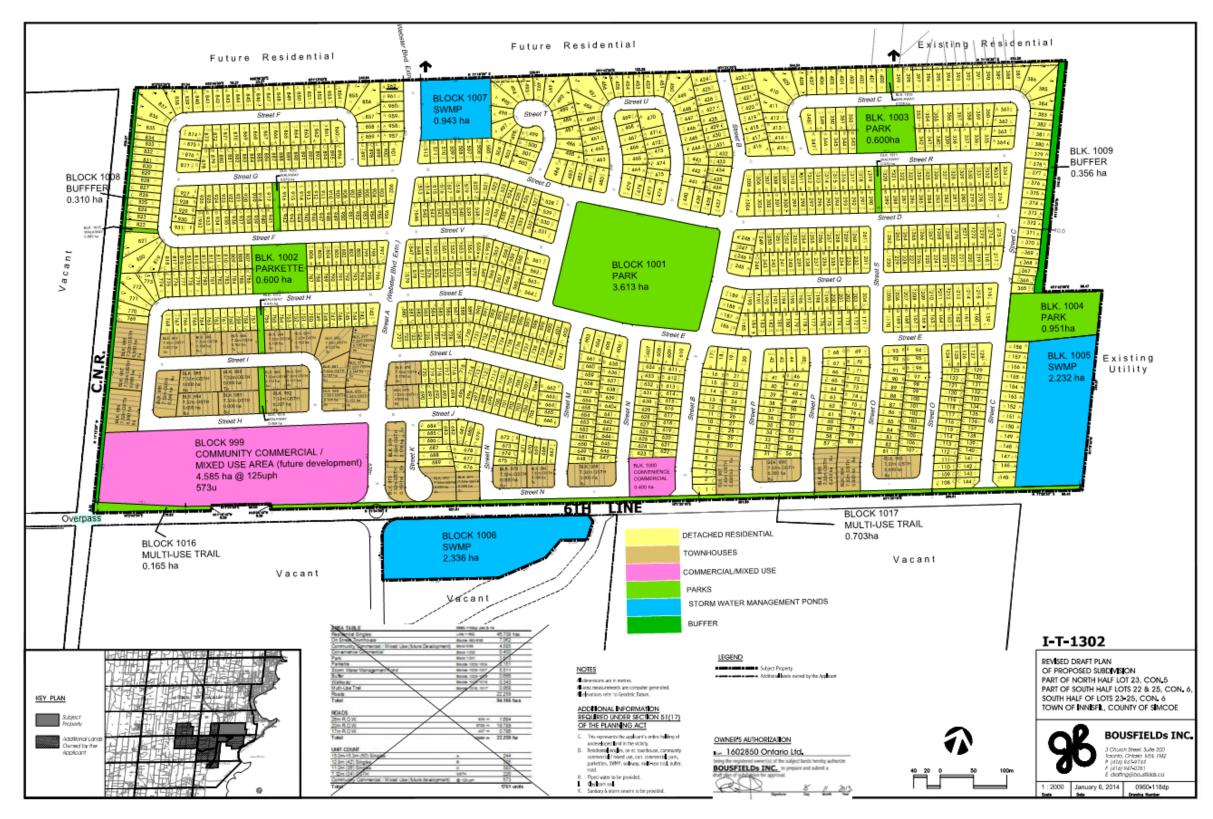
Sleeping Lion Draft Plan of Subdivision
